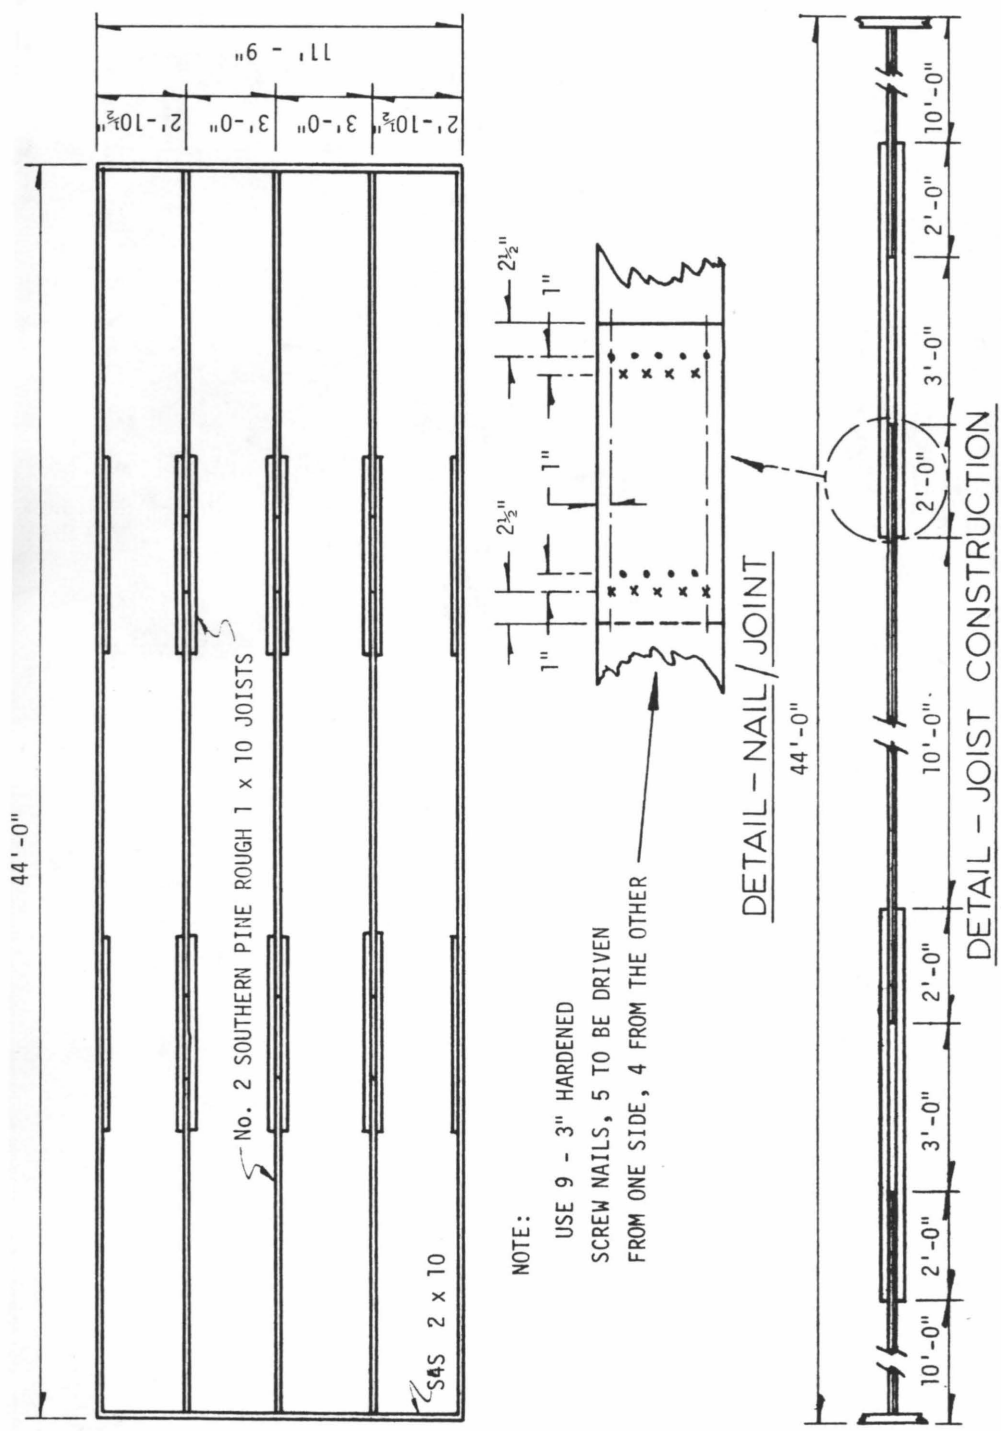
FLOOR FRAMING PLAN FOR TEST MODULE
